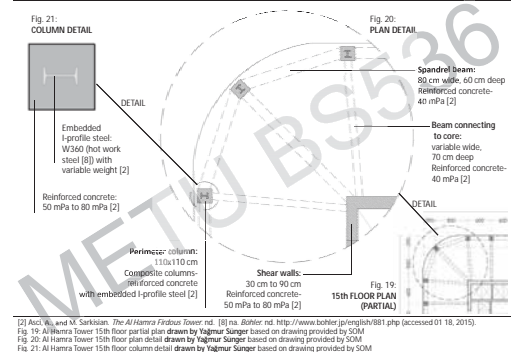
Al Hamra Tower 15th floor partial plan drawn by Yağmur Sünger based on drawing provided by SOM
